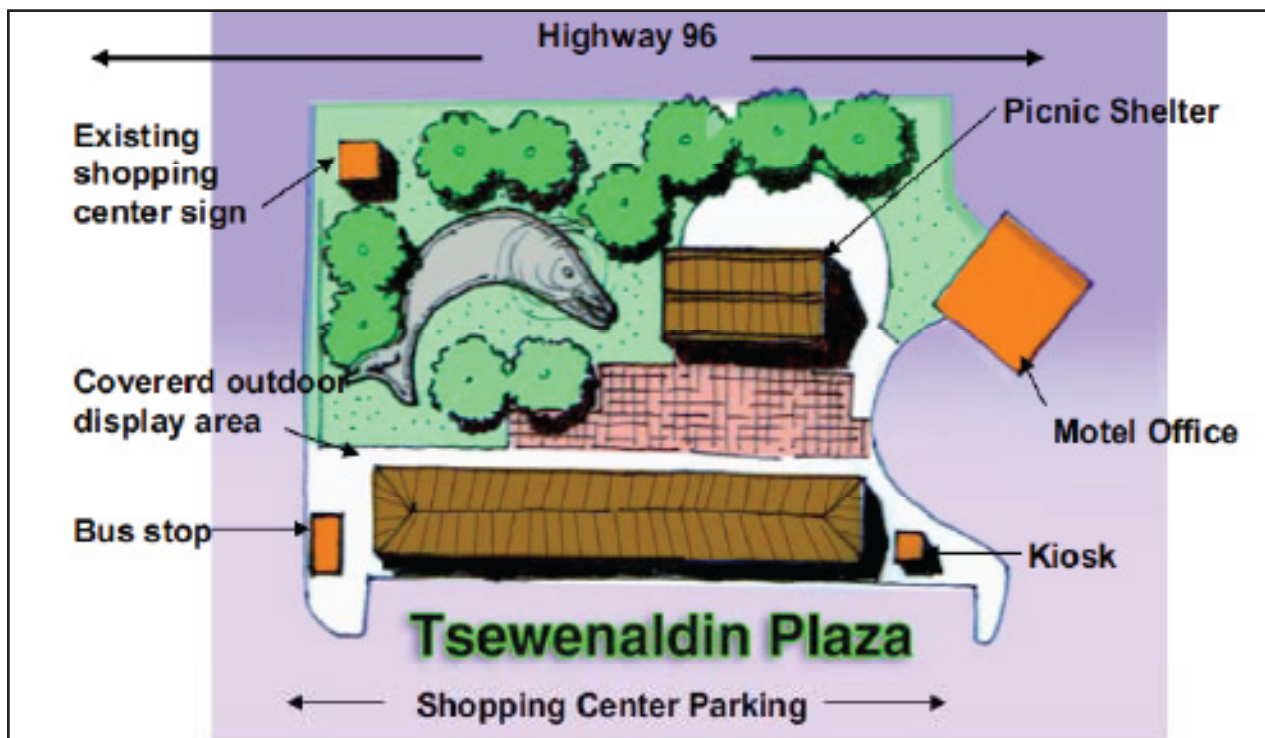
A Sketch of the Proposed Tsewenaldin Plaza
